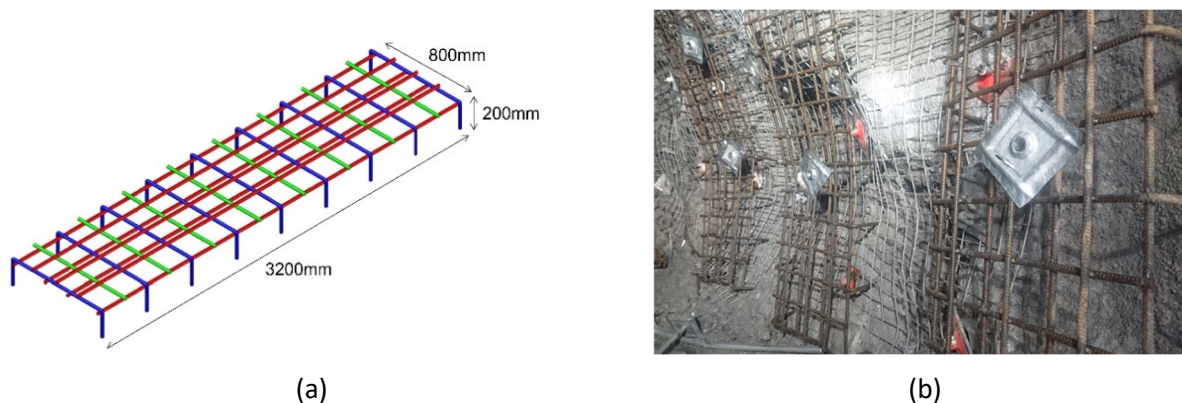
RRSA in Freeport Indonesia. (a) Rebar frame design; (b) Rebar frame pinned to the rock using 2.4 m friction bolt before FRS application
